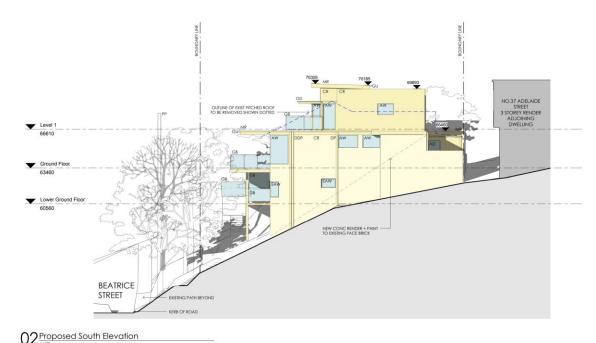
Proposed Southern Elevation, Source: Architectural Plans prepared by Red Blue Architecture, Drawing No. DA0204
